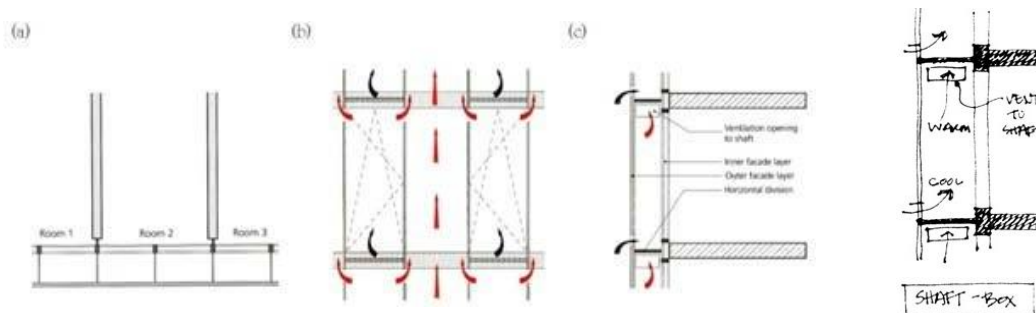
Shaft box type (a) plan, (b) section and (c) elevation
